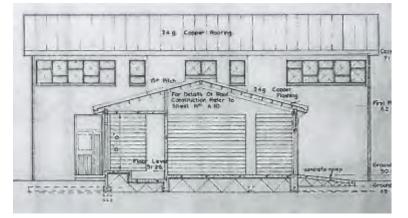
Building Section – Through Plantroom, Maintenance Building beyond
